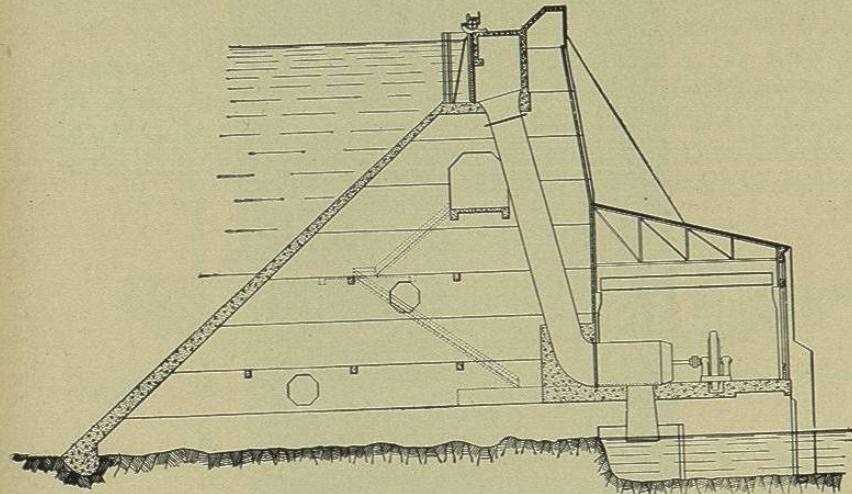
SECTION OF DAM 115 FEET HIGH, WITH POWER-HOUSE.
